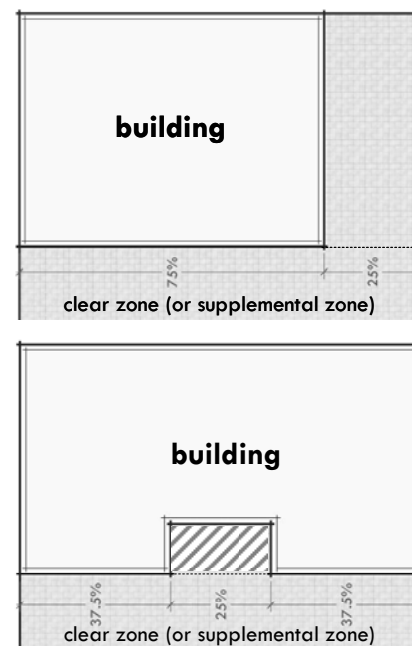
Examples of permitted building placement along core transit corridors. Parking is not permitted in the hatched area between the street-facing facade and the sidewalk.
